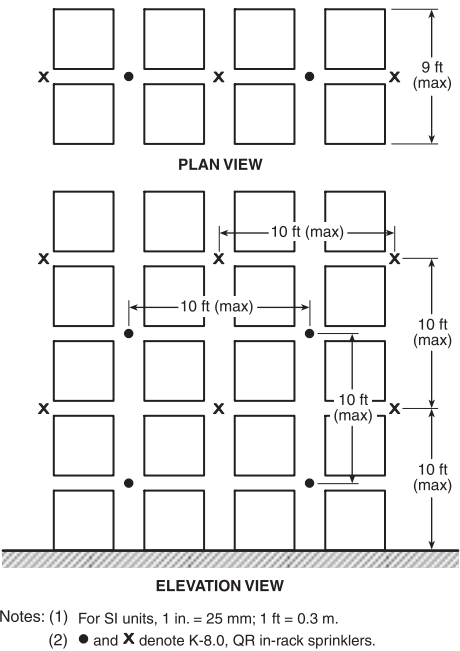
(b) Double-Row Rack Sprinkler Layout 8 — Option #1.
